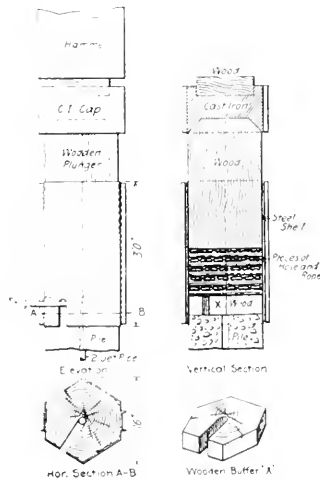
Cushion Cap used in driving the corrugated concrete pile.
